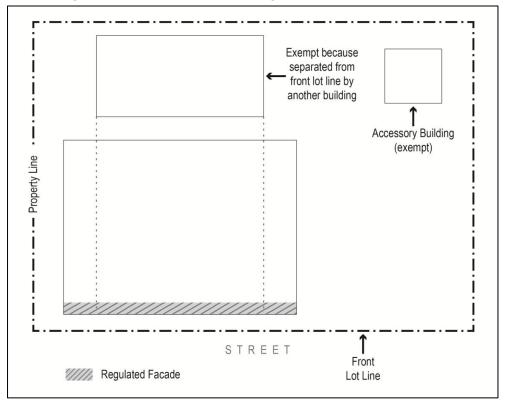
Regulated façades for Façade Design, Articulation and Window Standards.
